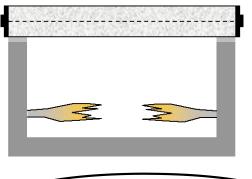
Horizontal test, representing a tunnel ceiling but also conservative for the walls
